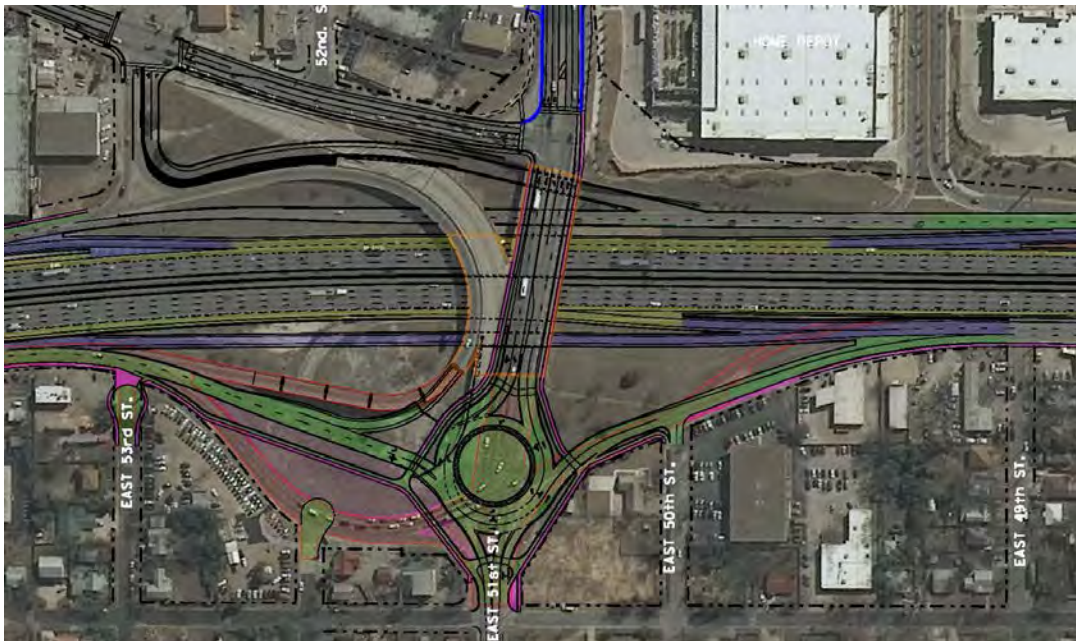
Roundabout Concept I-35 at 51st Street
